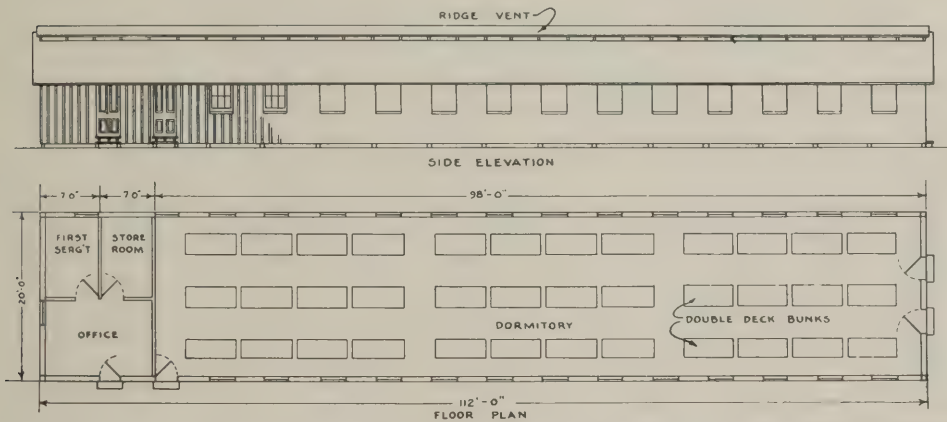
One-story barracks, 20 feet by 112 feet, with full ridge ventilation. Provides 54 square feet of floor space for each double-deck bunk and about 283 cubic feet of air space per capita for 72 men
